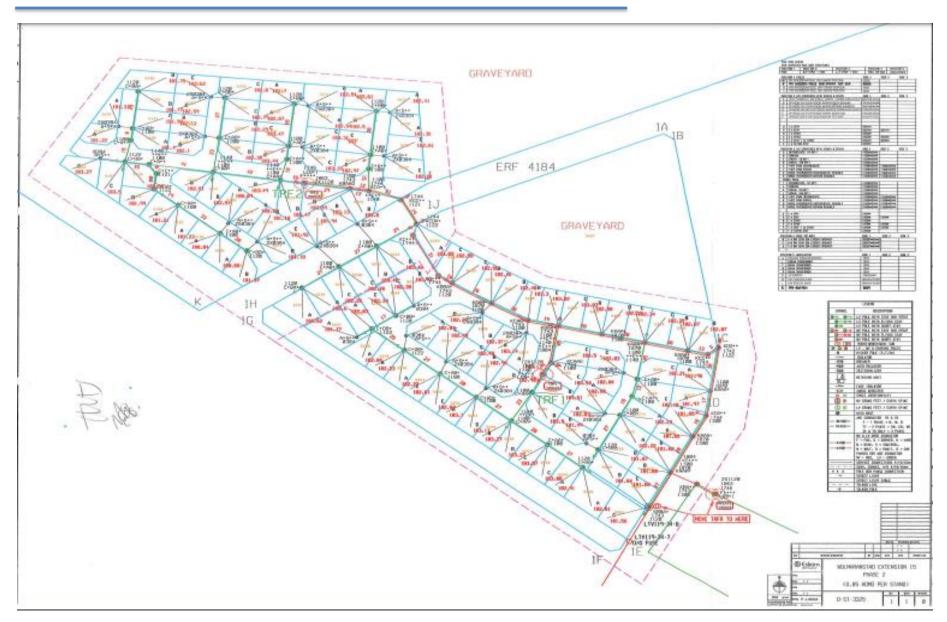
Layout plan for the proposed powerline development and the adjacent grave yard.
